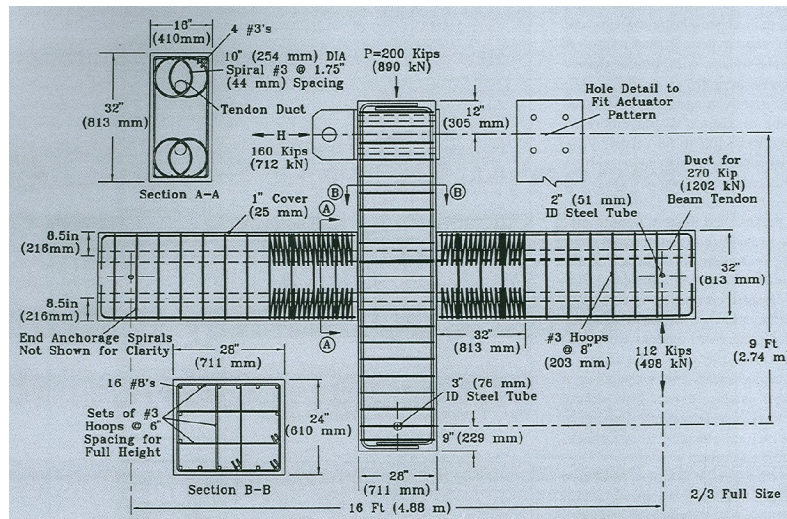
Interior joint specimen details (MacRae and Priestley 1996).
